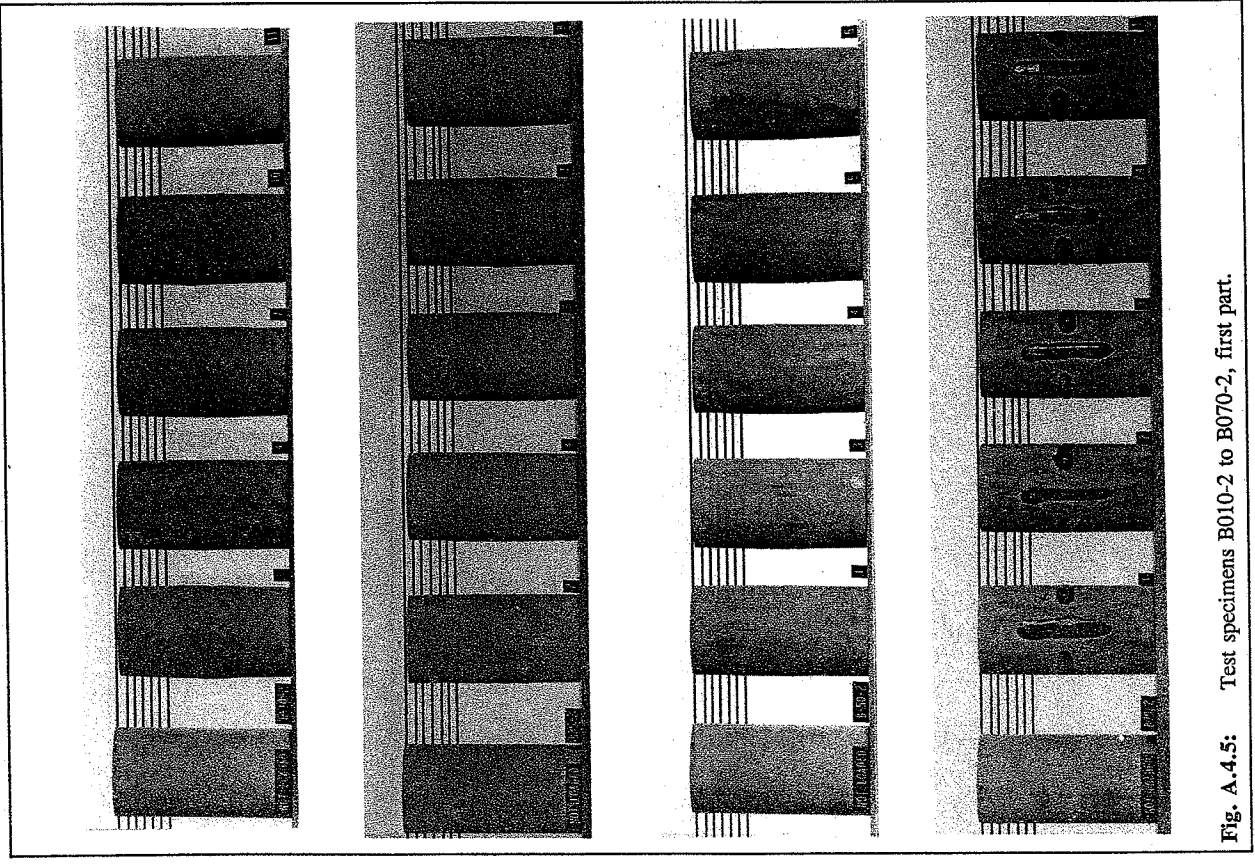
Test specimens B010-2 to B070-2, first part.
